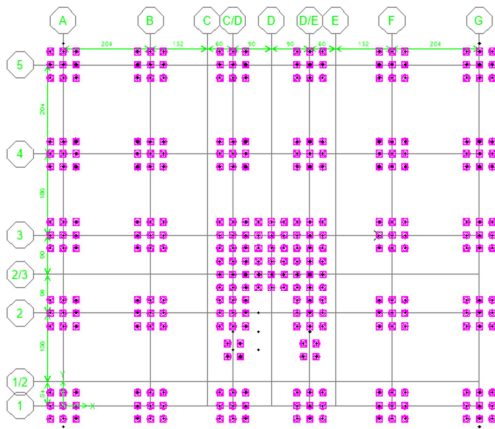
Spun Pile Layout Plan (Dynamics Load Case)
